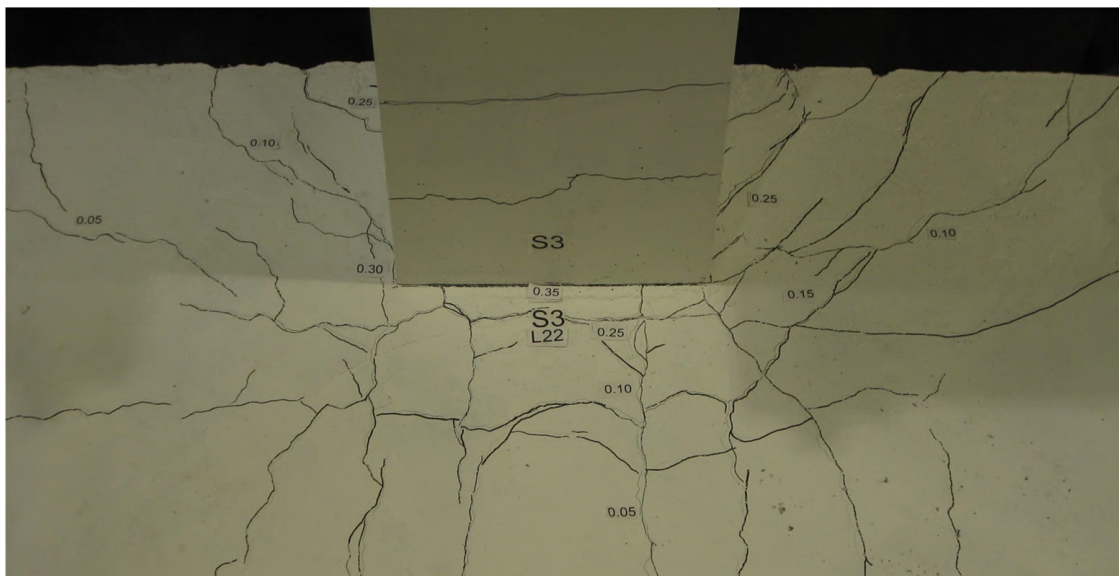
Specimen 3 slab cracks at $V = 234.9$ kN
